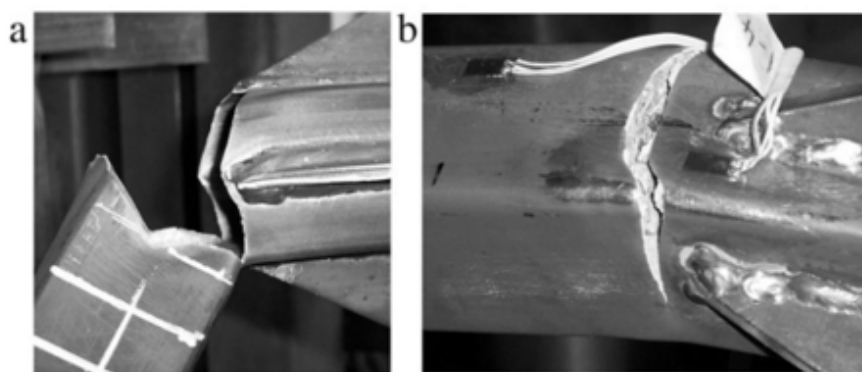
Failure modes of specimen 50SHS under impact load, where, (a) Steel tearing failure mode for hollow steel tube and (b) Steel rupture and concrete crush failure for filled steel tube by Bambach et al. [63].
